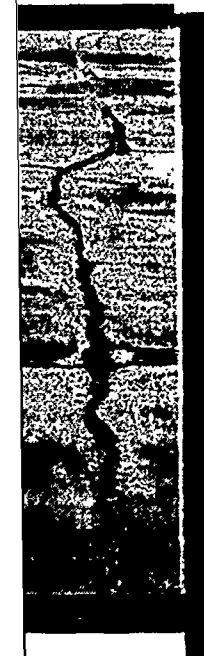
SPALLING TRANSVERSE CRACK ON TRANSIENT APPROACH
